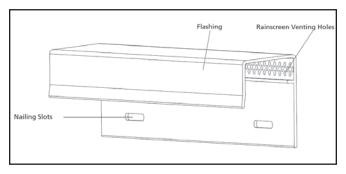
The top-of-wall flashing has ventilation holes at the rear.
